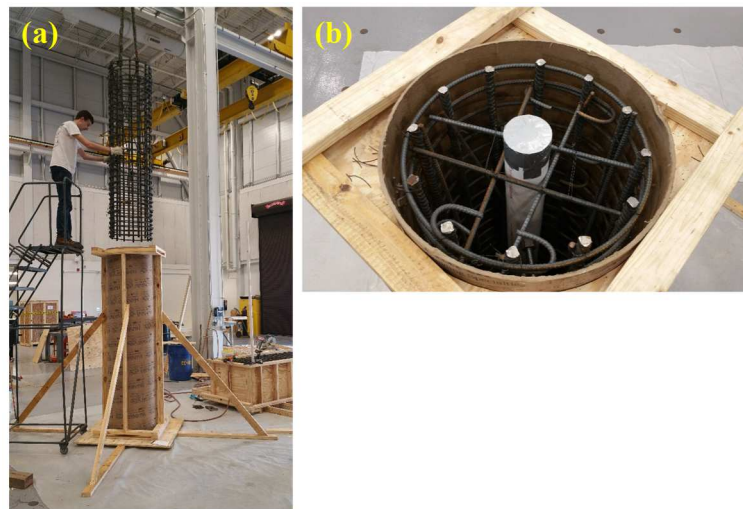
(a) Lowering the rebar cage of RC rocking column to formwork; (b) central PVC pipe secured and sealed.
